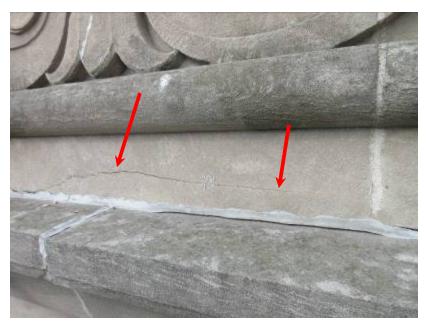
Spalls at the eighth floor cornice. Spall was sealed.
